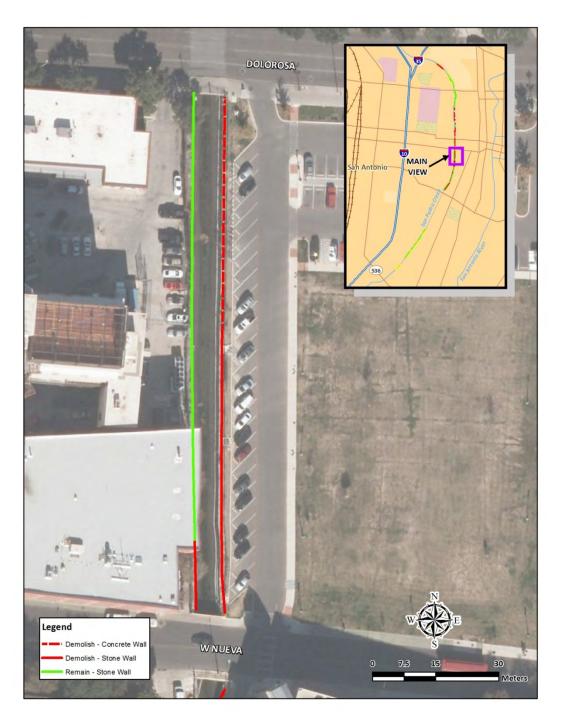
Proposed impacts to the west and east bank retaining walls between West Dolorosa Street and West Nueva Street.
